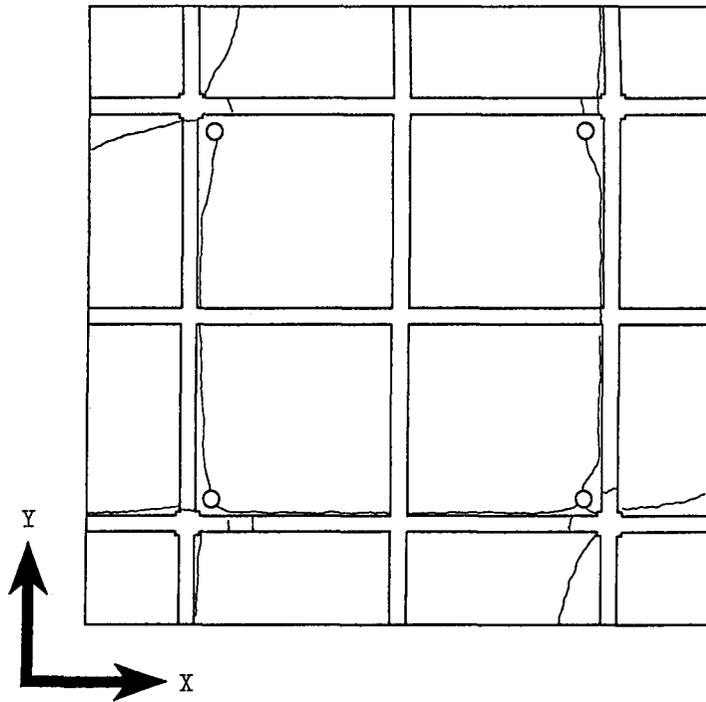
Crack Patterns of Weak Beam Structure at 3rd Floor System
